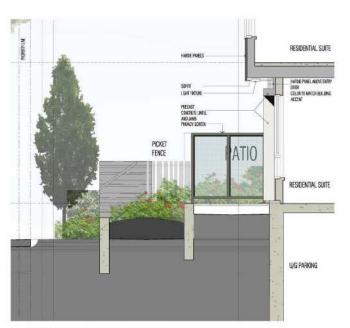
DETAIL ELEVATION OF TOWNHOUSE SCALE 1/25
